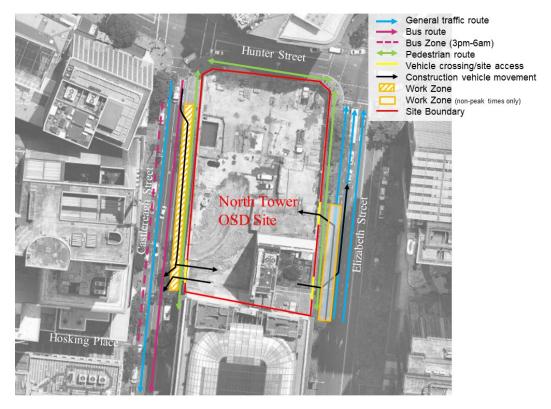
TSP 2 Site Access and Traffic Staging Plan
